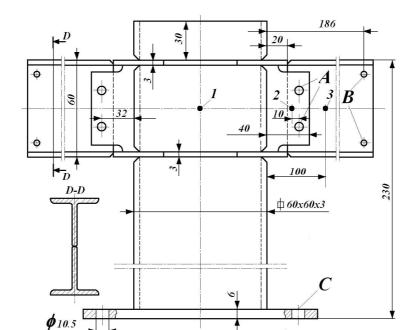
The tested beam-to-column connection (at 1:5 ratio reduced scale model)
